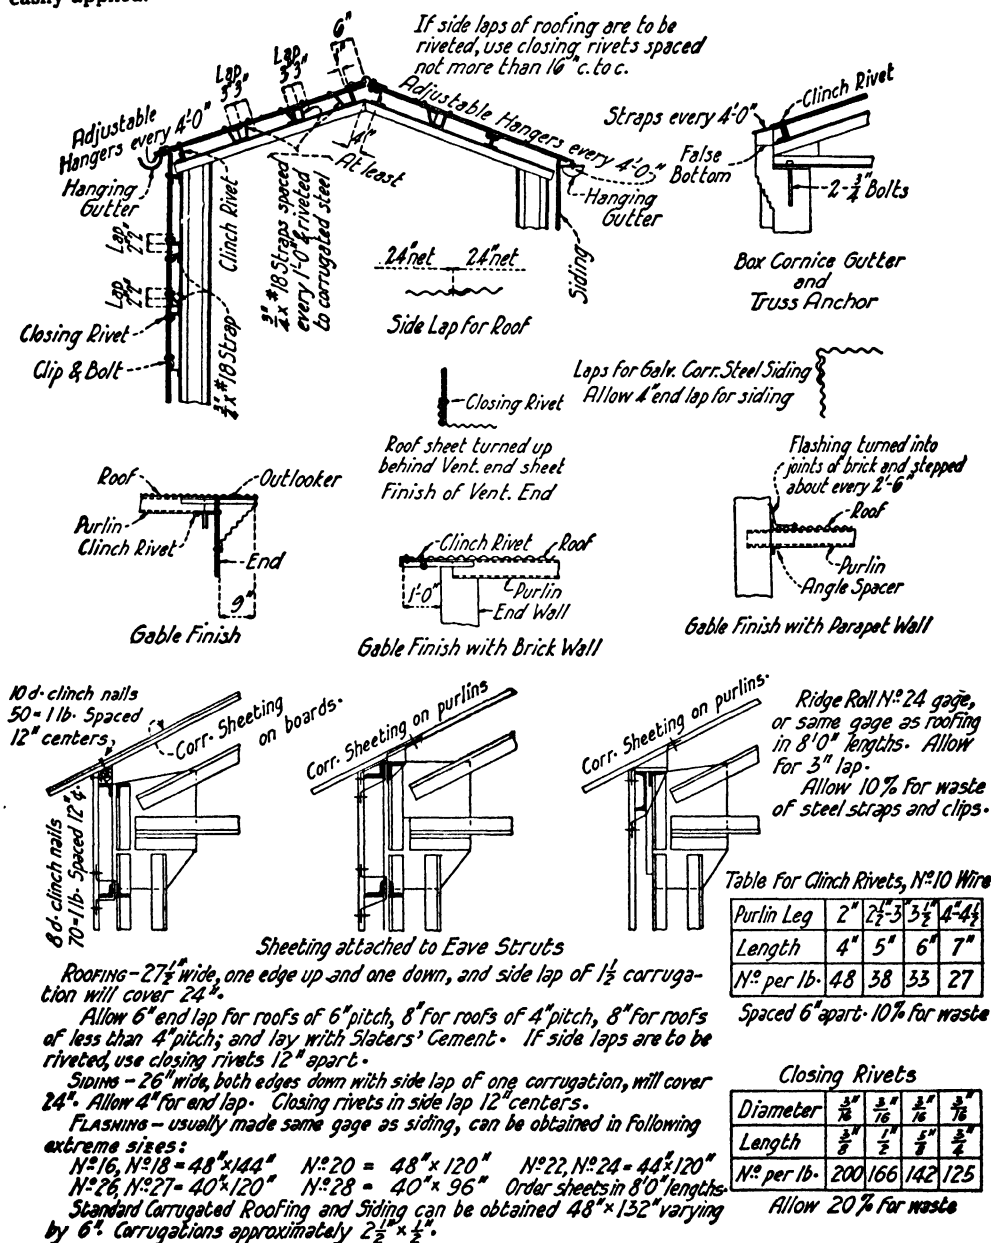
STANDARD DETAILS FOR CORRUGATED STEEL.
